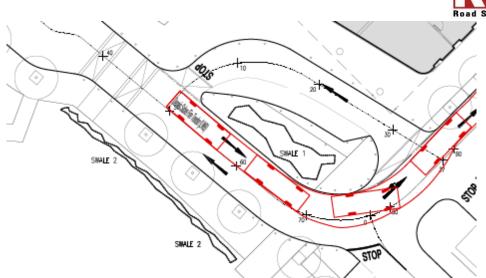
Bollards Adjacent to Carriageway at Crossing Points
